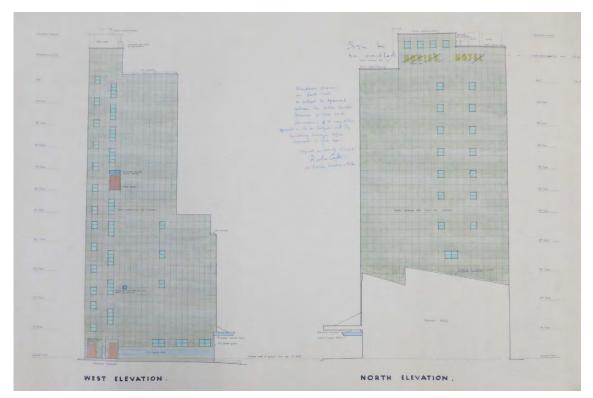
West and north elevations. Annotation notes that the 'Hosies Hotel' metal sign to the north elevation was to be omitted. Drawings by Mussen Mackay & Potter, dated August 1953 (BAP; south and east elevation drawings not located) (BAP).
